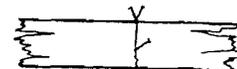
Batter strip with two nails driven V-shaped in place of notching the wood. One way is as good as the other.
